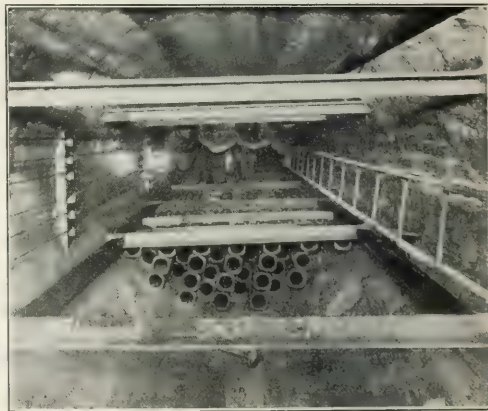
SHAFT TO WASHINGTON STREET TUNNEL
